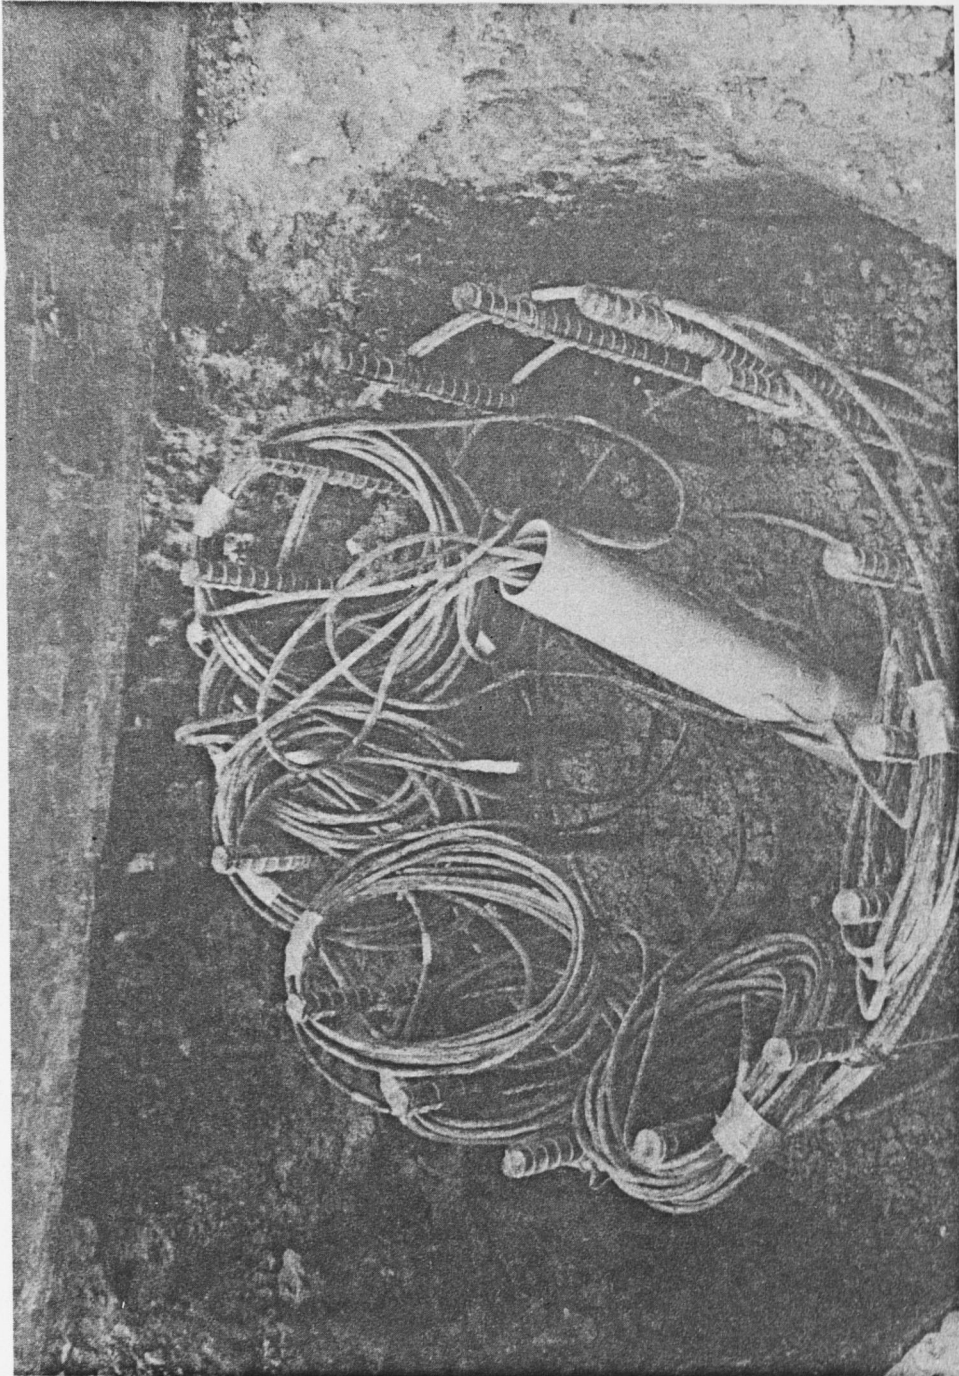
COMPLETED JOB OF INSTRUMENTATION ON PIER J-3
